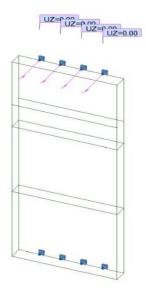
EXAMPLE OF STEEL BRACKETS ANCHORING LAYOUT
